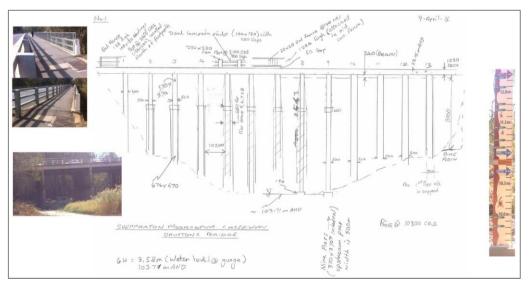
DAINTONS BRIDGE SKETCH PROVIDED BY GOULBURN BROKEN CMA
